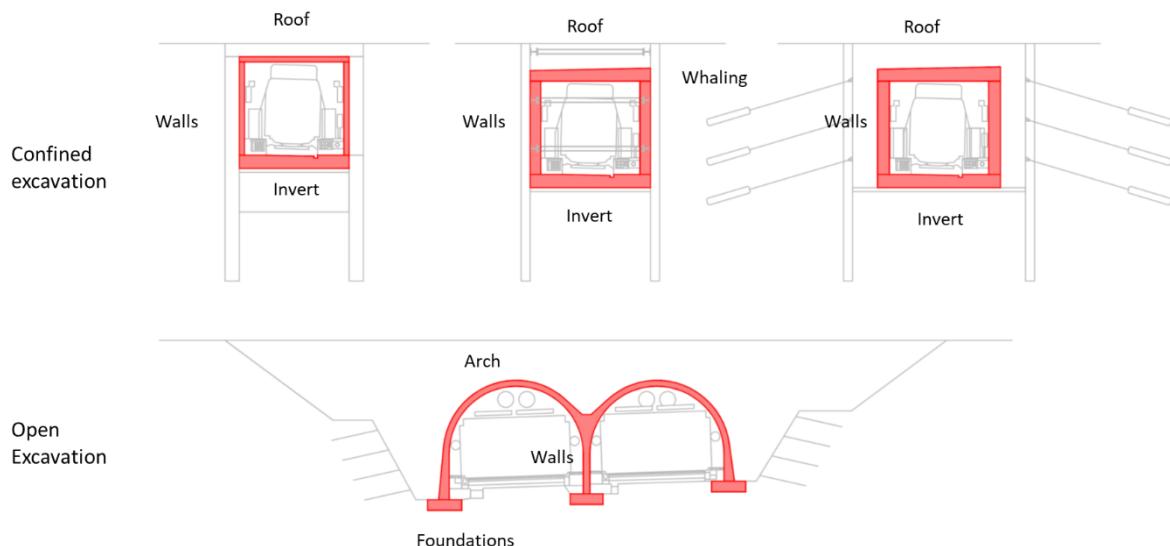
Typical lining configurations in cut and cover construction (source SBB/ILF)
